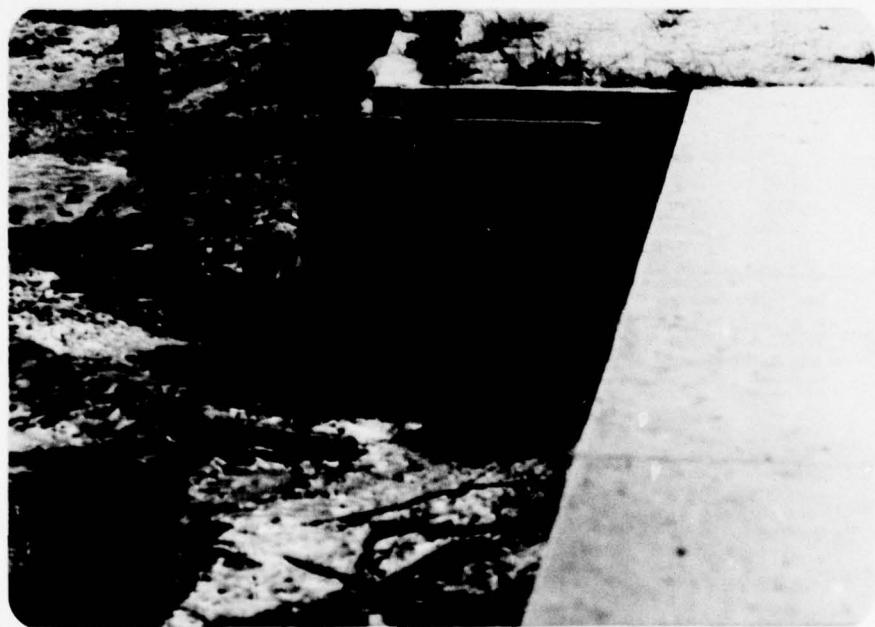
Upstream channel side of left abutment. Concrete facing is missing exposing fill material and timber piling. (Photo taken September 7, 1978)
